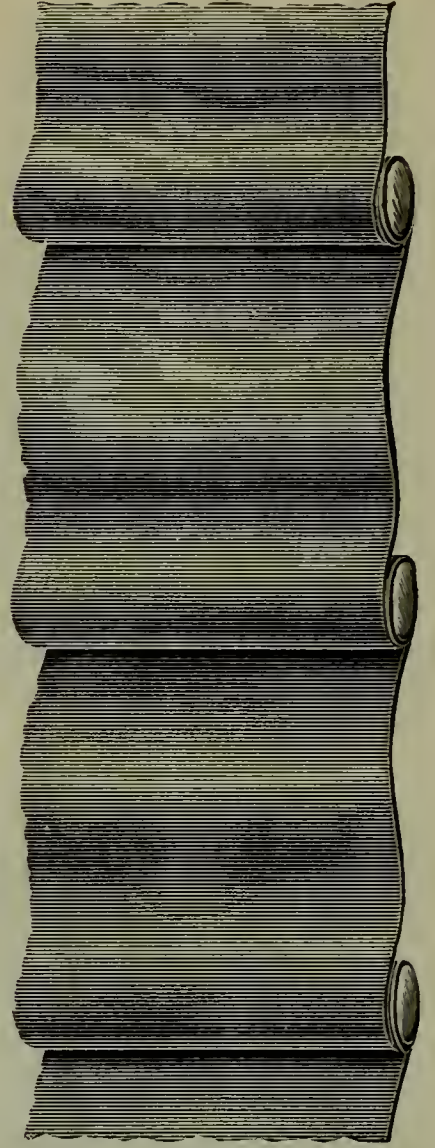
VIEW OF SLATS FROM OUTSIDE.
